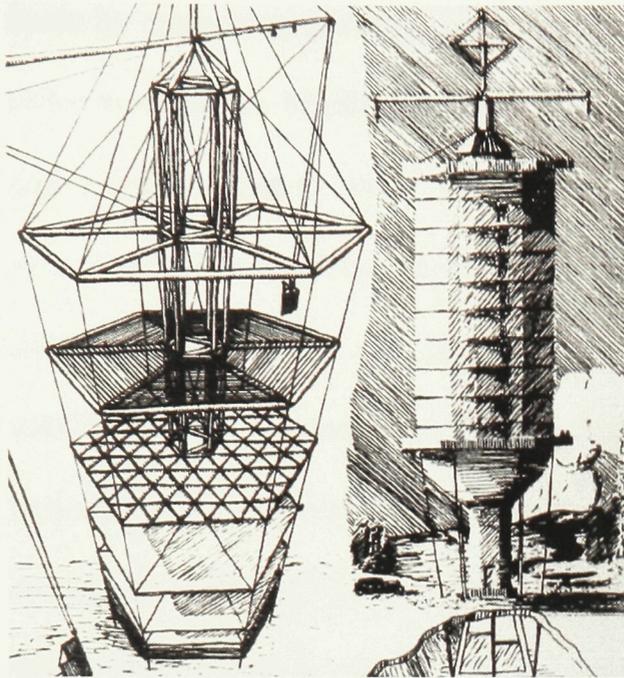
Sketch of the structural arrangement- tension and compression, Dymaxion House in a multi-story format.
